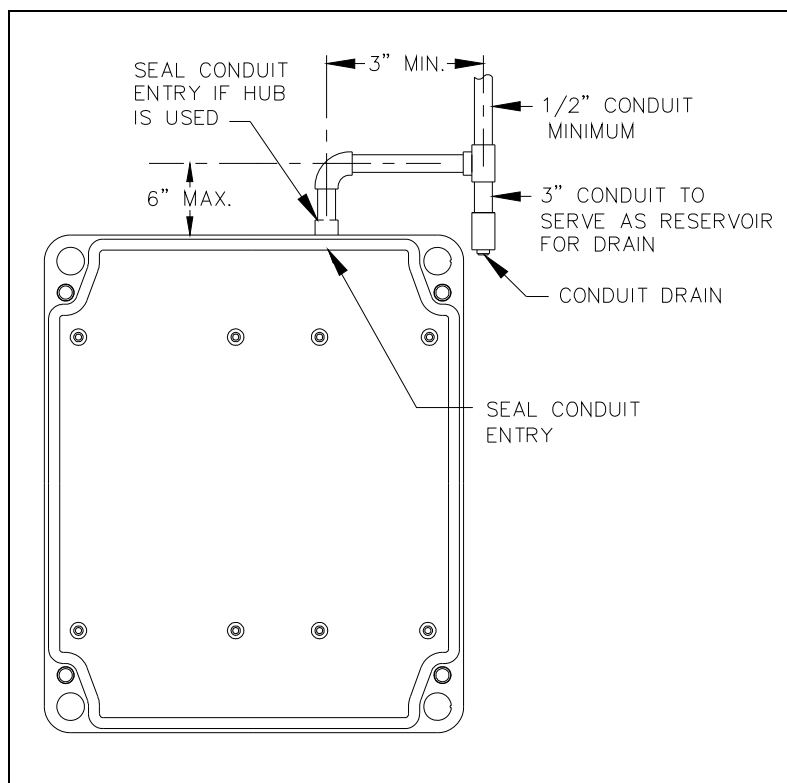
Top entry conduit installation details (NOT RECOMMENDED)
